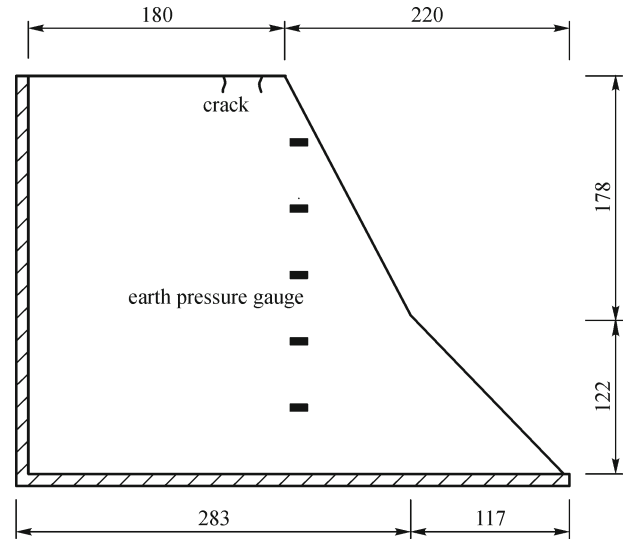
Final failure shape of A-A cross-section with bolt reinforcement in case 5 (unit: mm)
